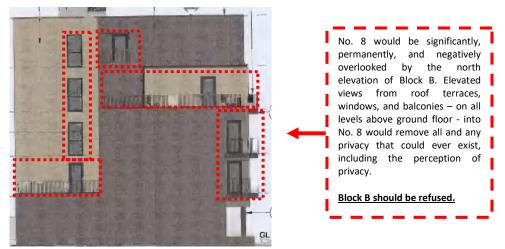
ROOF TERRACES, WINDOWS AND BALCONIES PROPOSED TO OVERLOOK NO. 8
